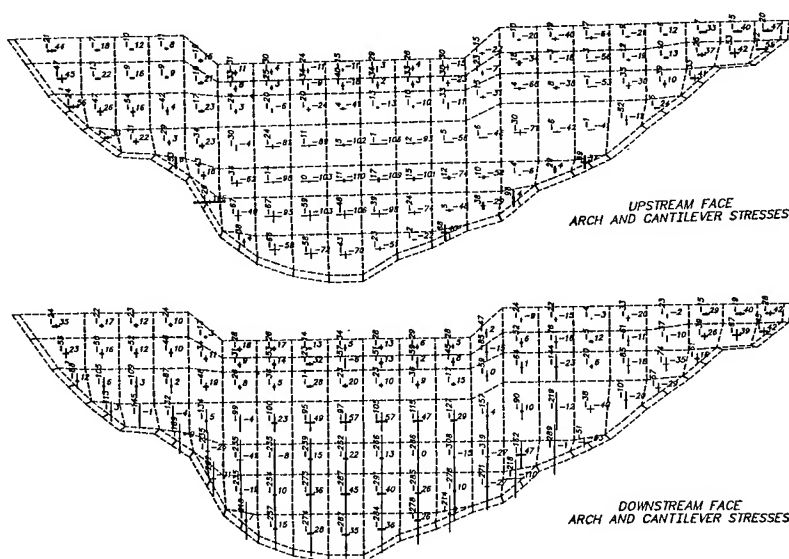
PMF Reservoir El. 555.5, Minimum Foundation Modulus
